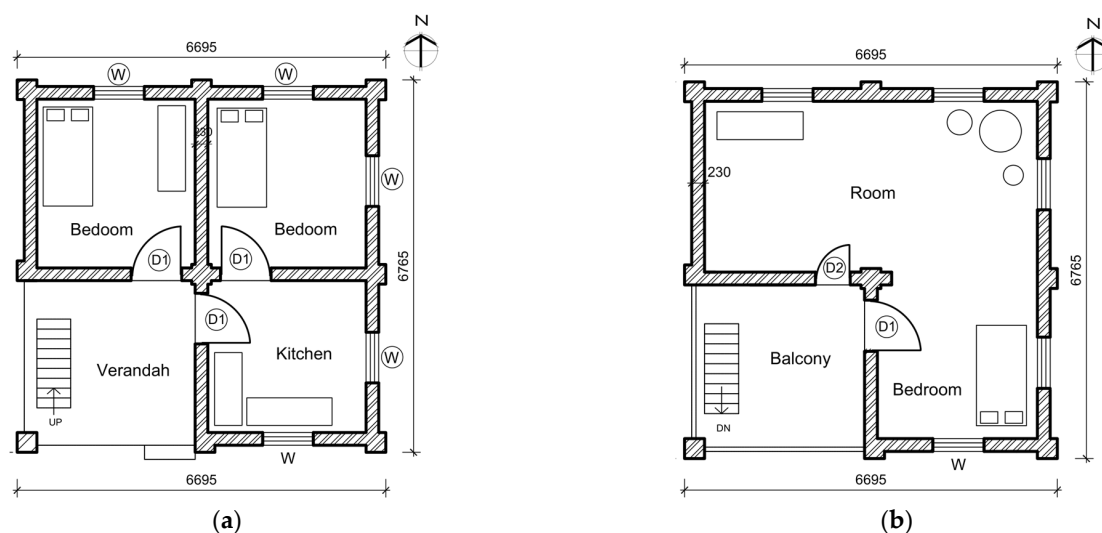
Floor plans of a post-disaster permanent house: (a) ground-floor plan; (b) first-floor plan.
